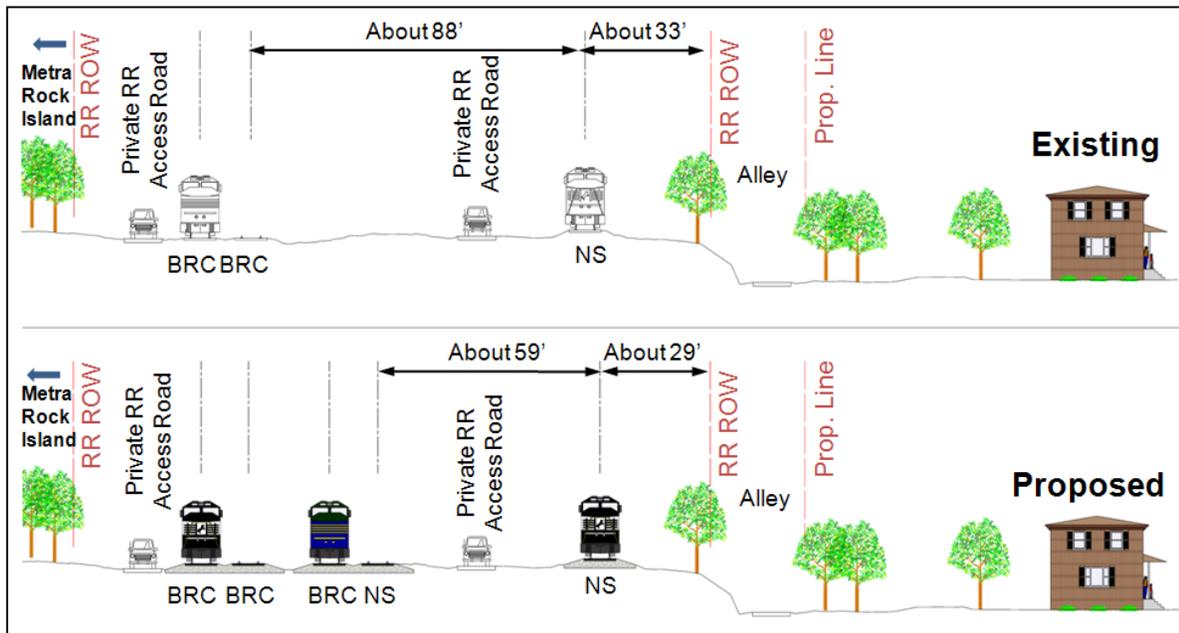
Alternate 80-1 and Existing Conditions, Looking North near 79th Street
